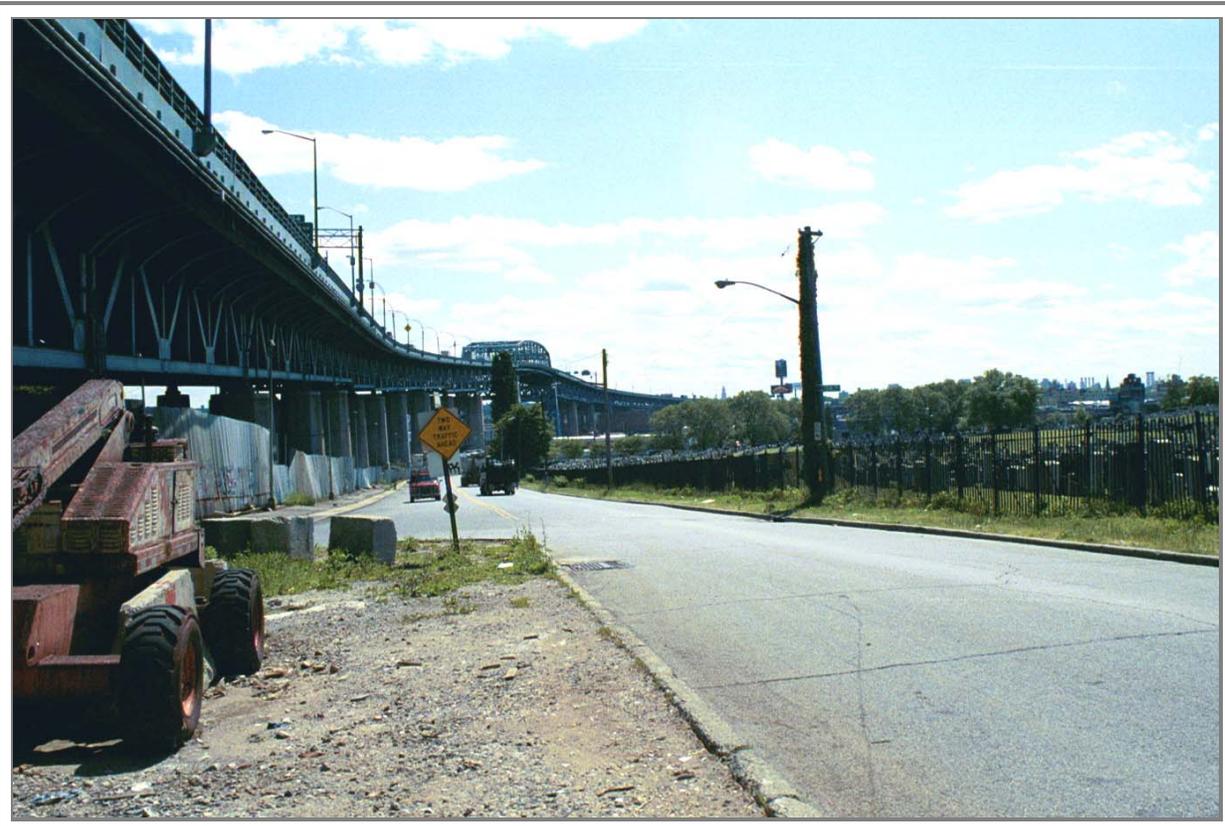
Extent of Kosciuszko Bridge looking south from Laurel Hill Boulevard, Queens, New York
